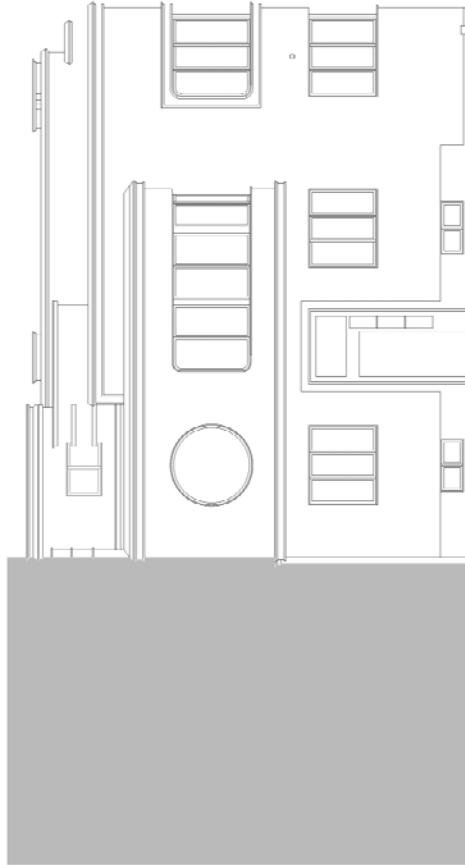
Laisvės Avenue 55, Former Pieno Centras
